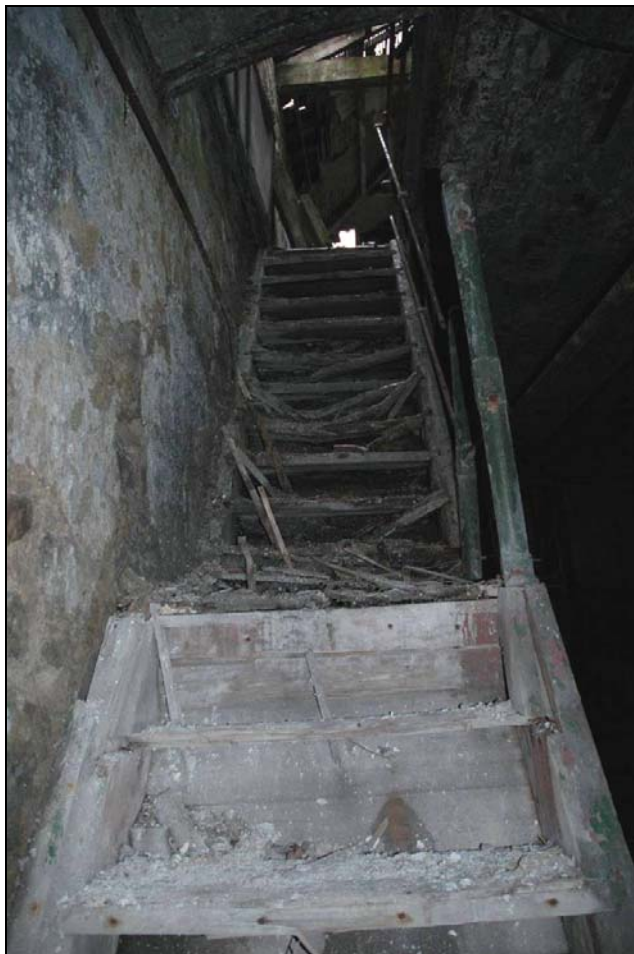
Internal staircase between ground and first floors in building 1, looking south (2005)
